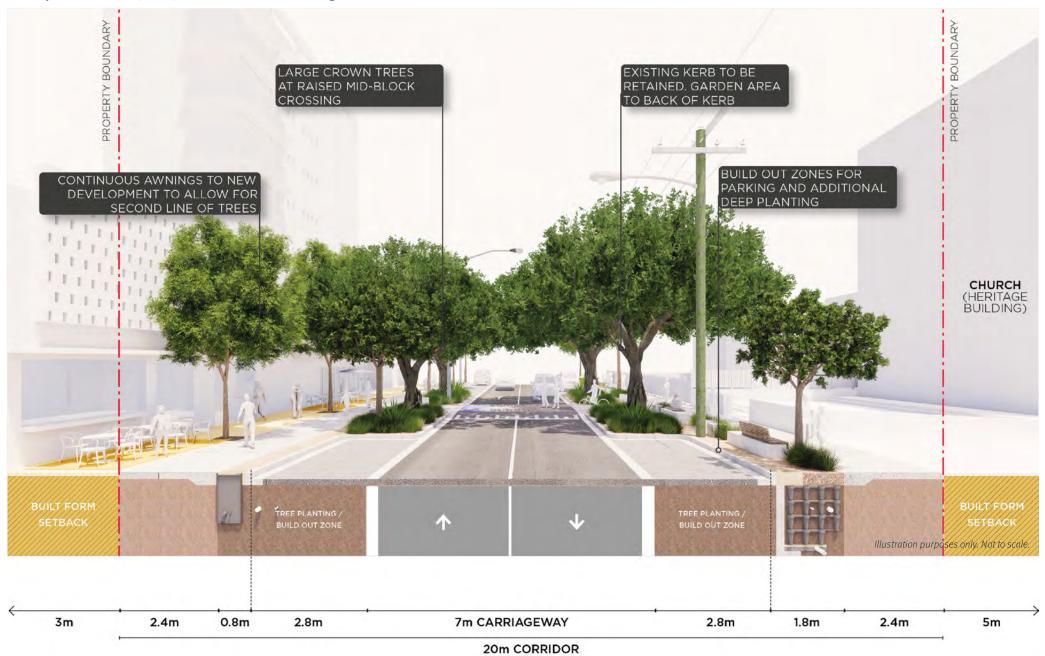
Cross section - Hawthorne Street - subtropical boulevard (minor)
